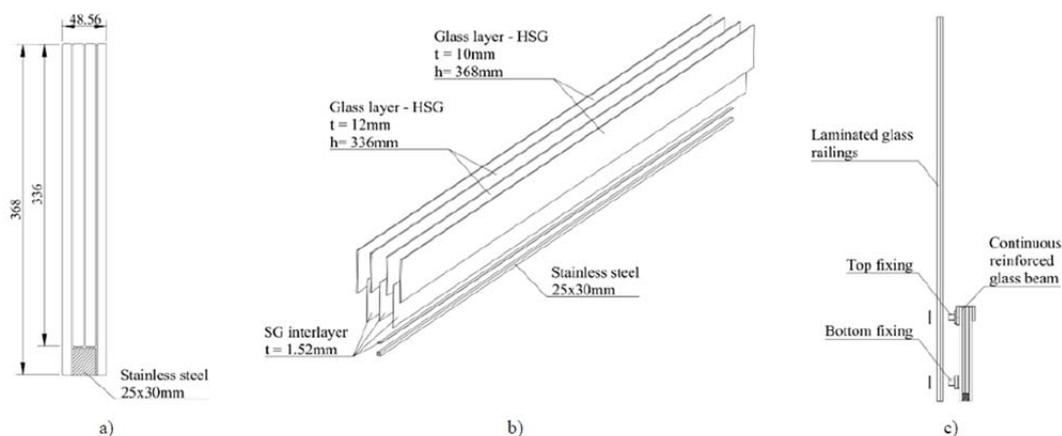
reinforced laminated glass beam of the glass footbridge (Mamone, Masiello, Lani. 2016)
